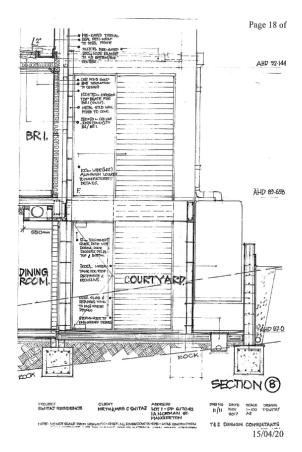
Retaining between proposed dwelling and courtyard of approved dwelling
